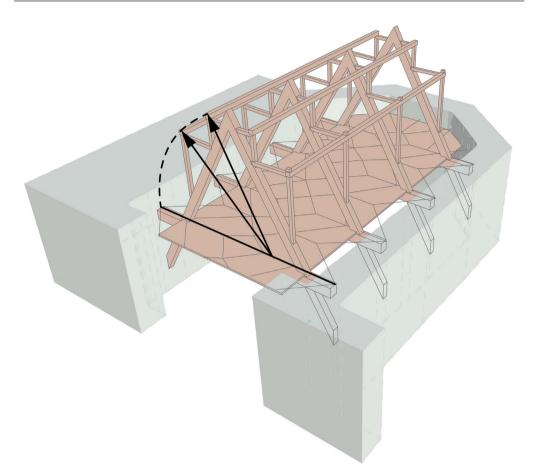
The main cross-sections' construction method's appearance as temporary supporting structures
